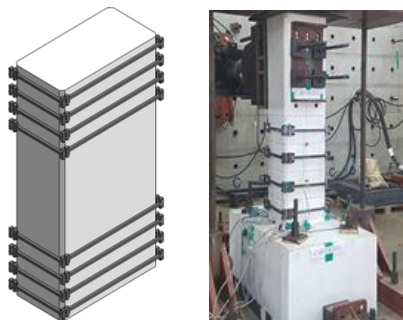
Conceptual design of a column reinforced with steel bars and its application
